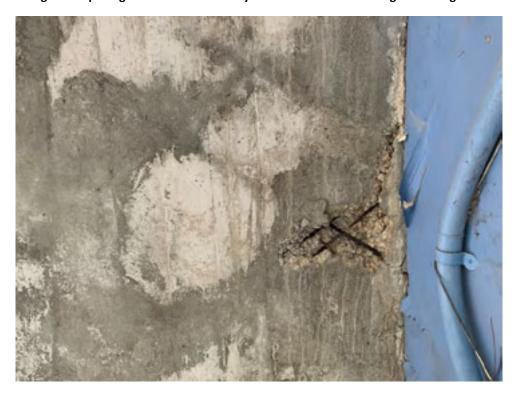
Spalling concrete and severely corroded steel reinforcing at existing roof.
